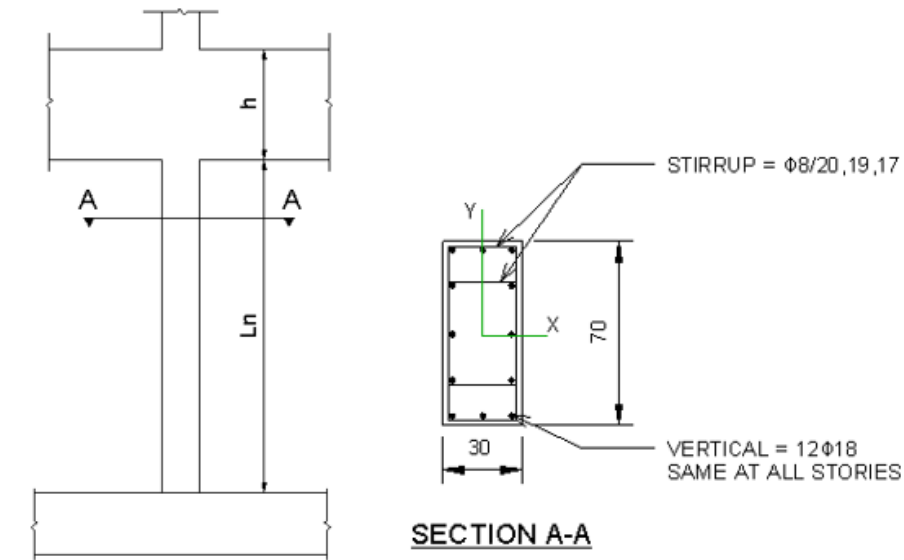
Elevation and section of column S19 (dimensions in cm).
